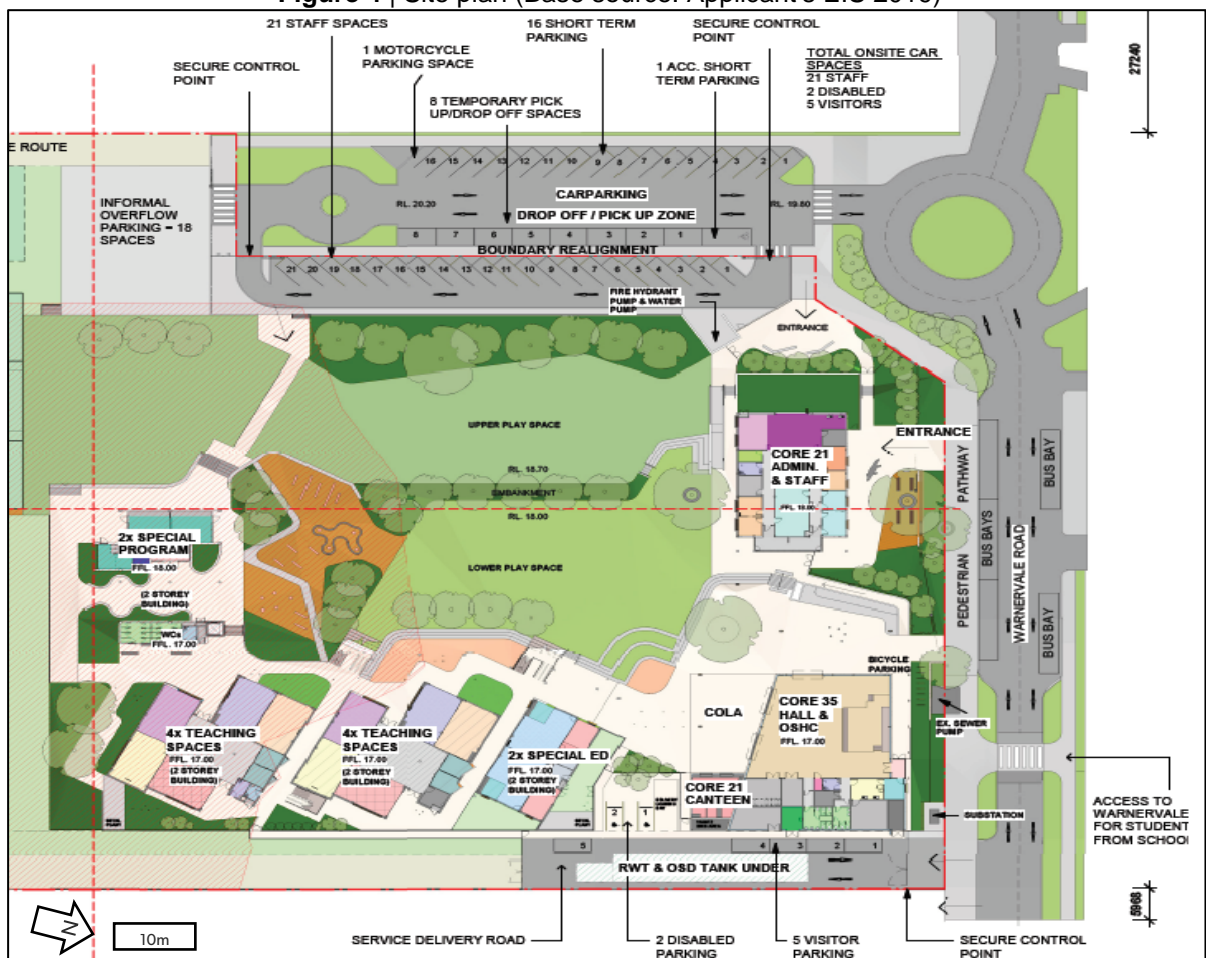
| Site plan (Source: Applicant's EIS 2019)
